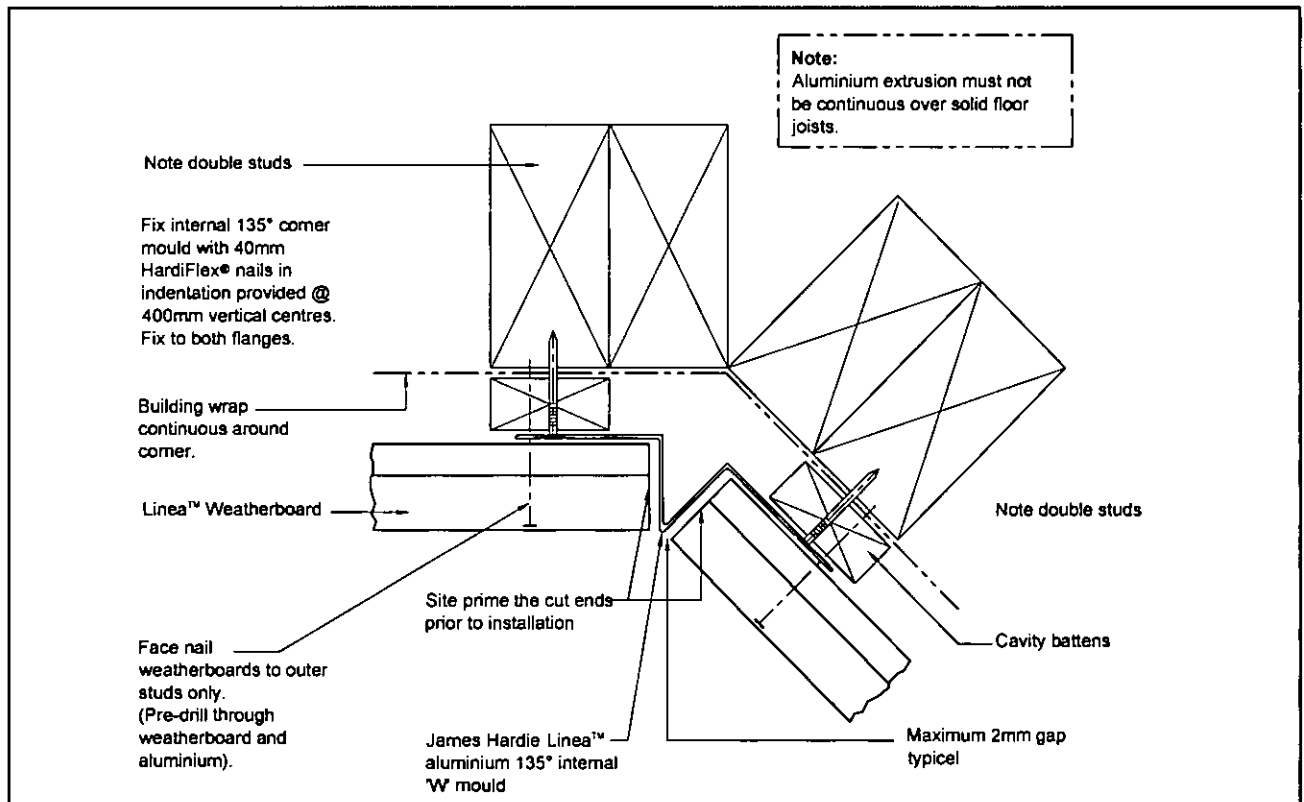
CAVITY INTERNAL 135° ALUMINIUM 'W' MOULD CORNER
